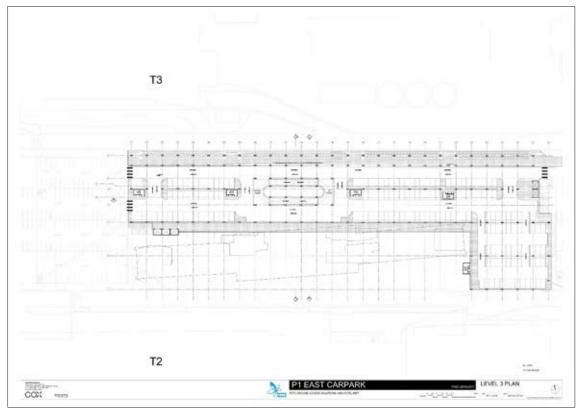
P1 East car park – indicative floor layout for additional floors
